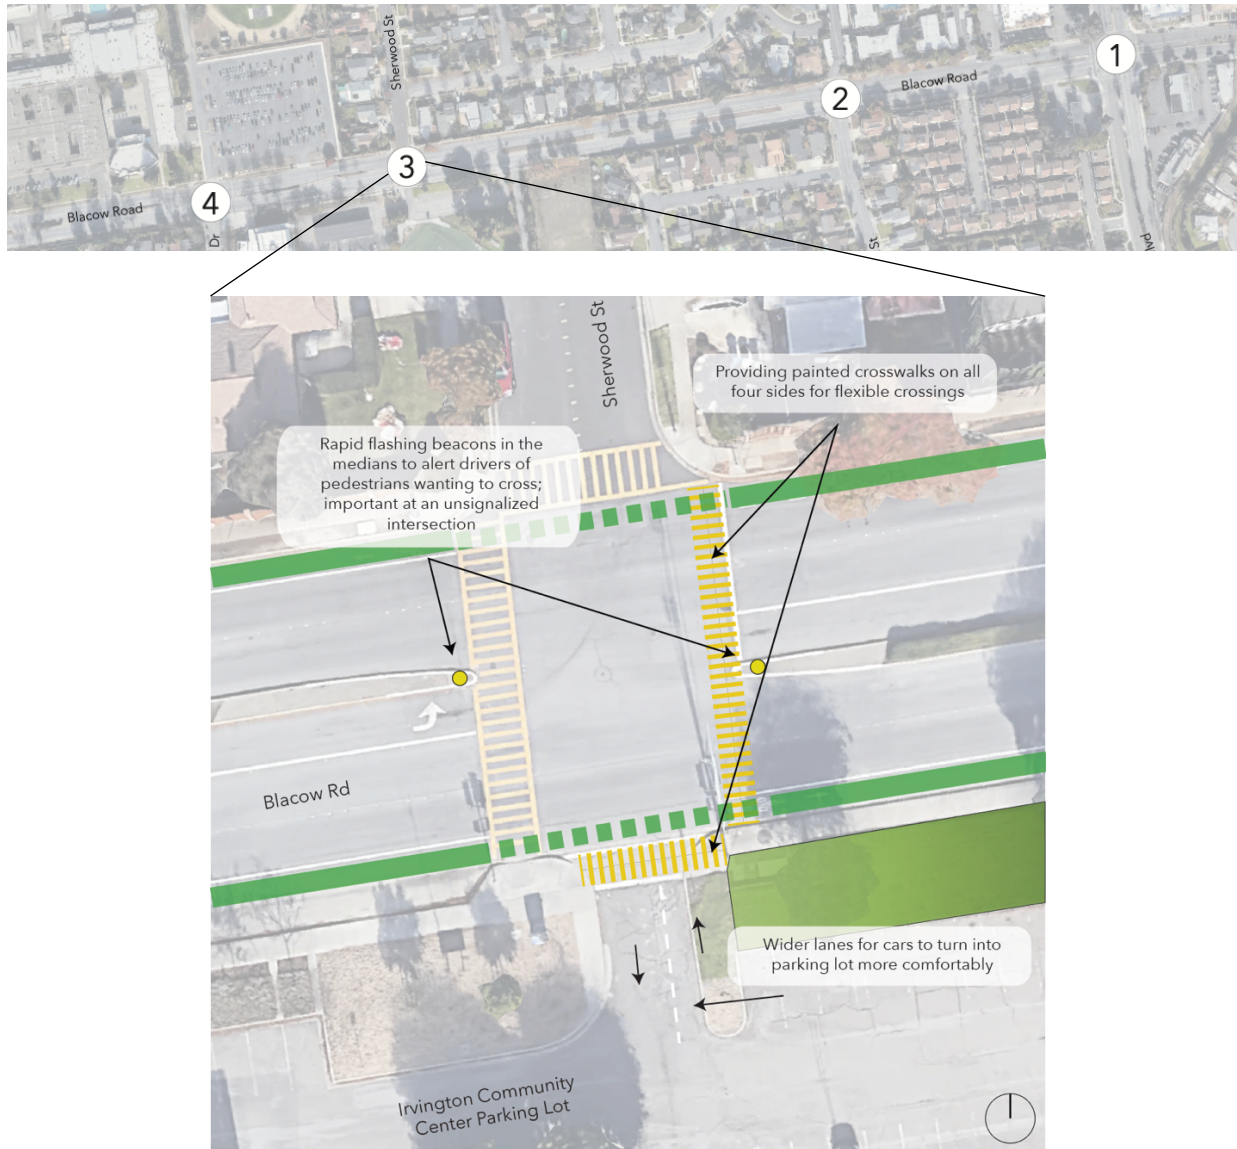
Recommended Improvements at the intersection of Blacow Road and Sherwood Street
